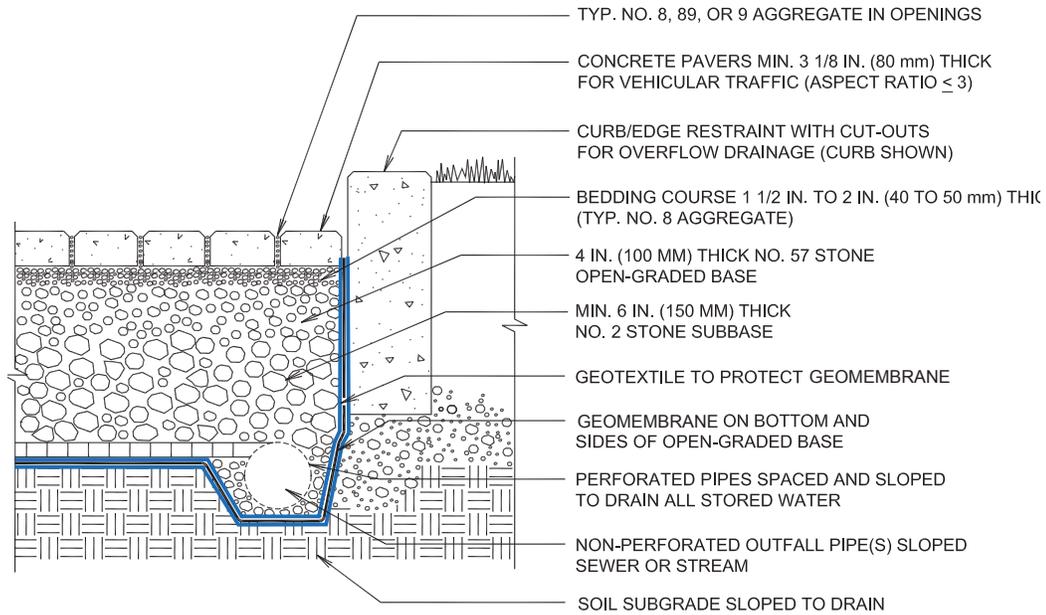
No infiltration Permeable Interlocking Concrete Pavement
